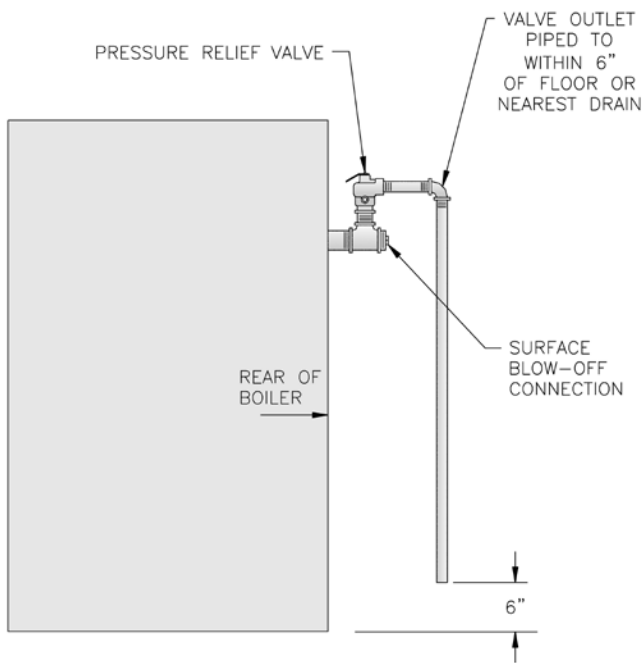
Steam Boiler - Pressure Relief Valve Hook-up
